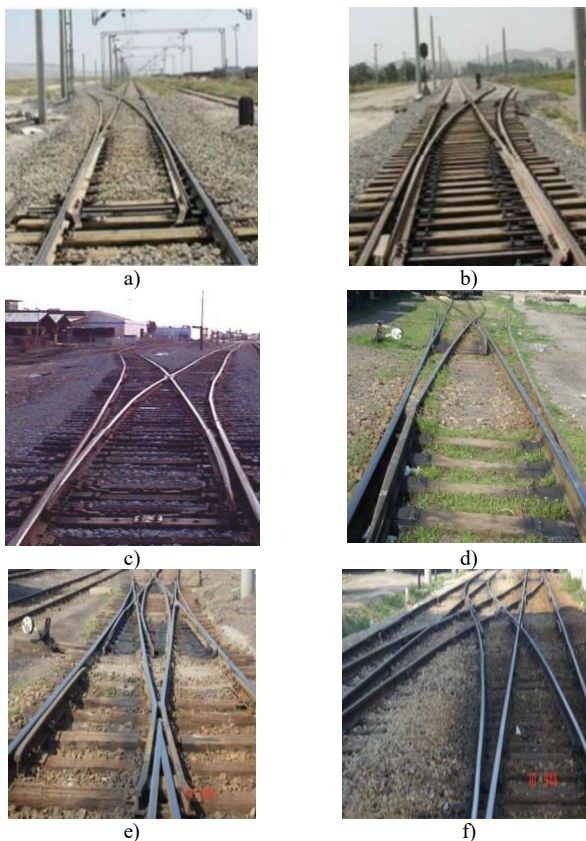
Sample images of the railway switch types a) Single left switch b) Single right switch c) Symmetric switch d) Compound switch e) Cross switch (full cross) f) crossover [13-15]
